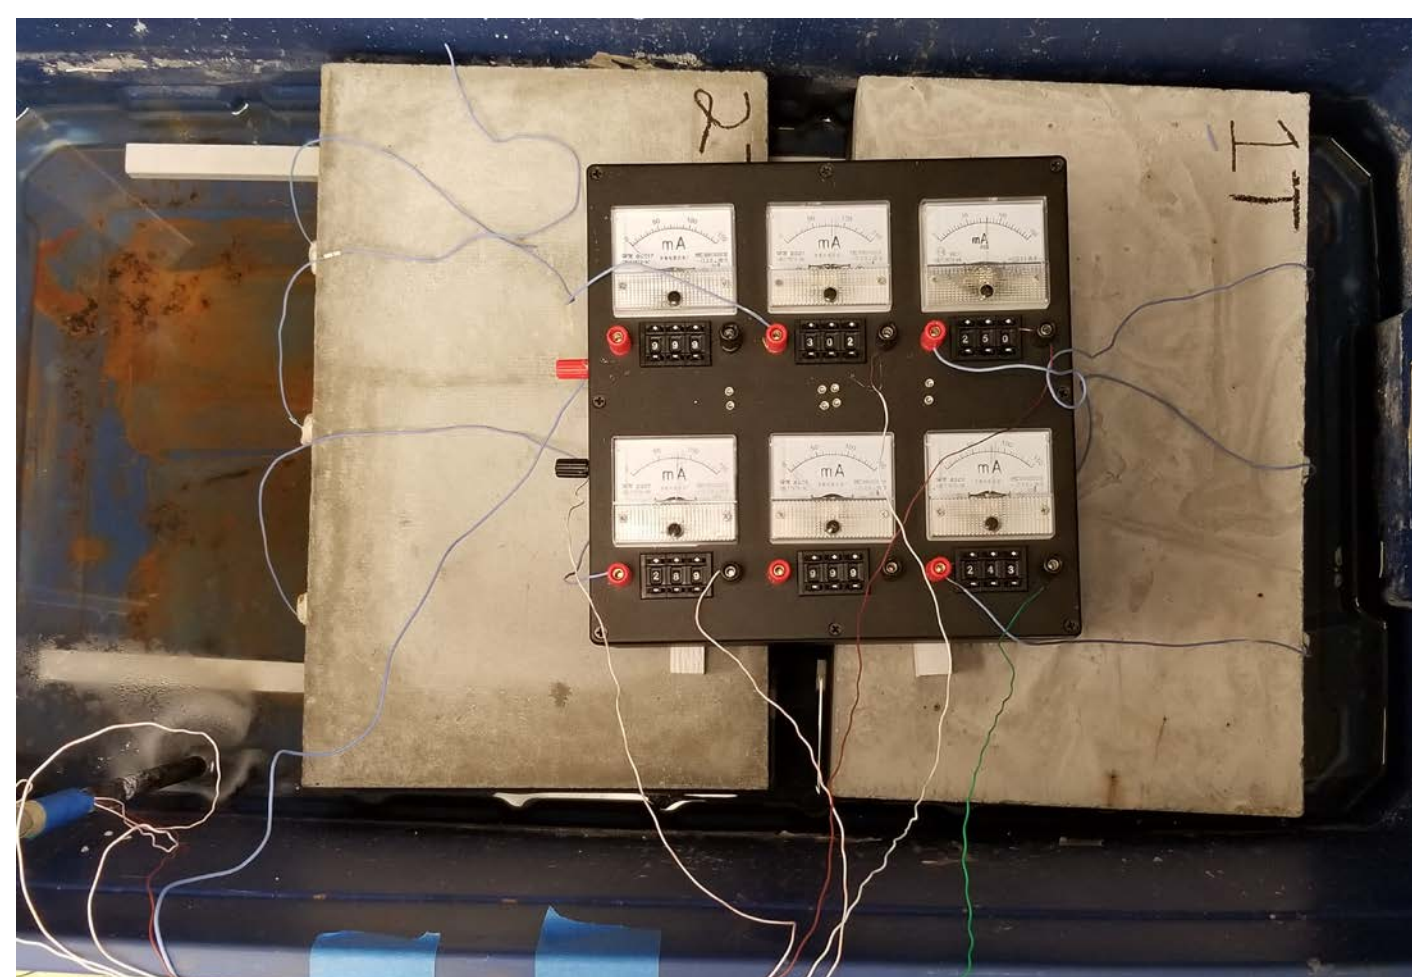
Larger concrete blocks and new electrical circuit to corrode all rebars uniformly.
